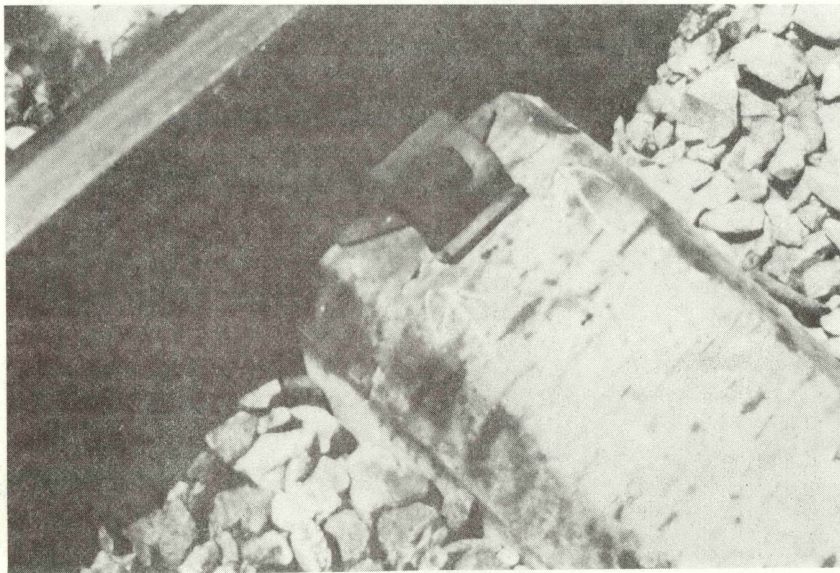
Rail Seat Crack - through rail fastener bearing surface (1)
